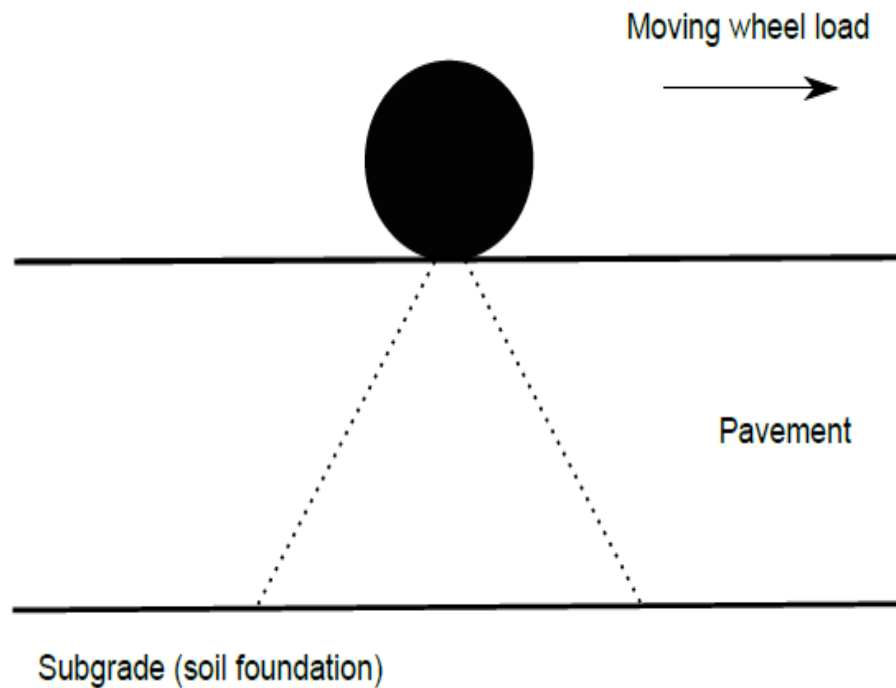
Wheel Load Distribution through Pavement Structure (Thom, 2008)
